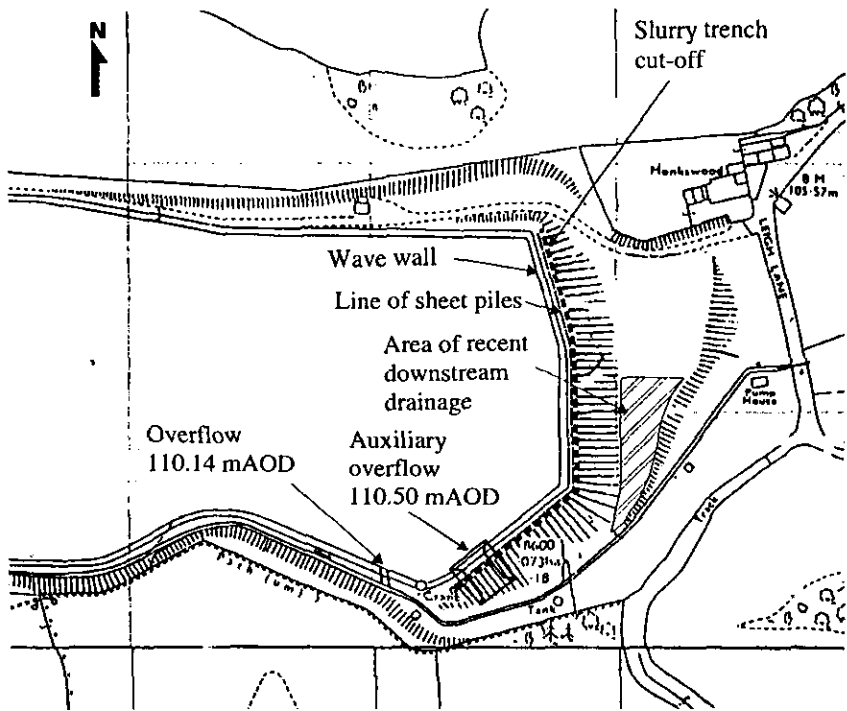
Plan of Monkswood Reservoir showing extent of sheet piling and slurry trench cut-off wall
